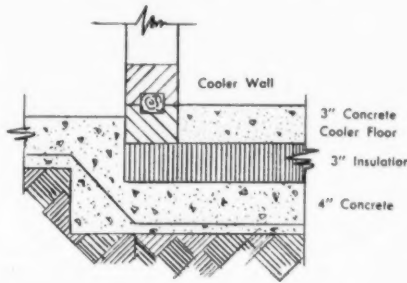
Cooler installed with 3-in. insulation between cooler floor and concrete store floor.
